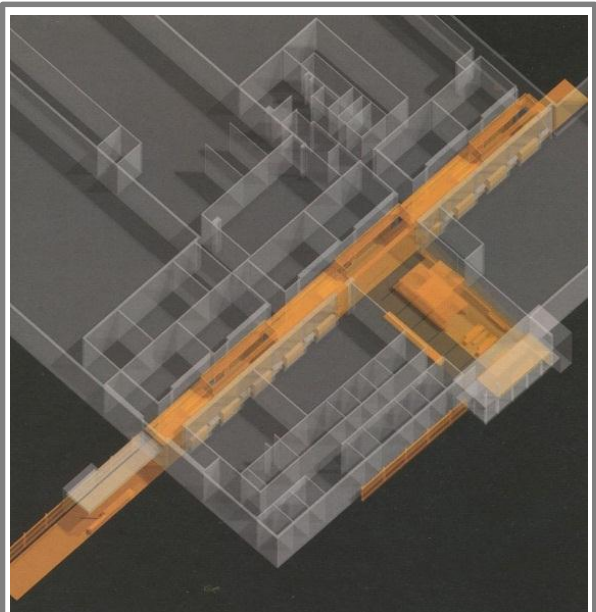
The defined internal street – connecting with the campus (Taggart, 2006: 40).
